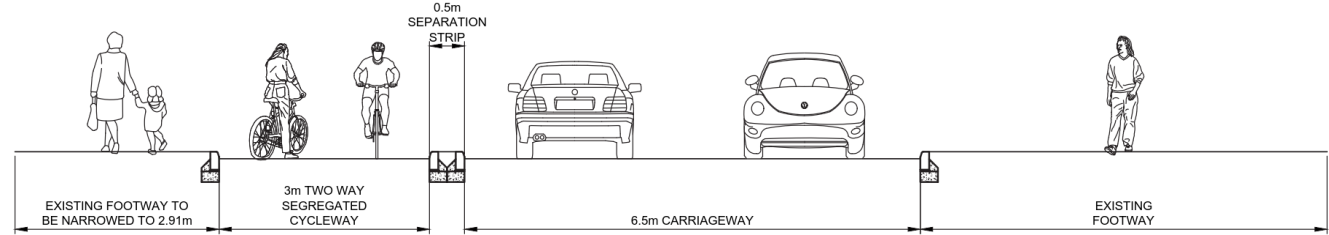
Cross Section Route 7: Peffermill Road, adjacent to Craigmillar Castle Road
